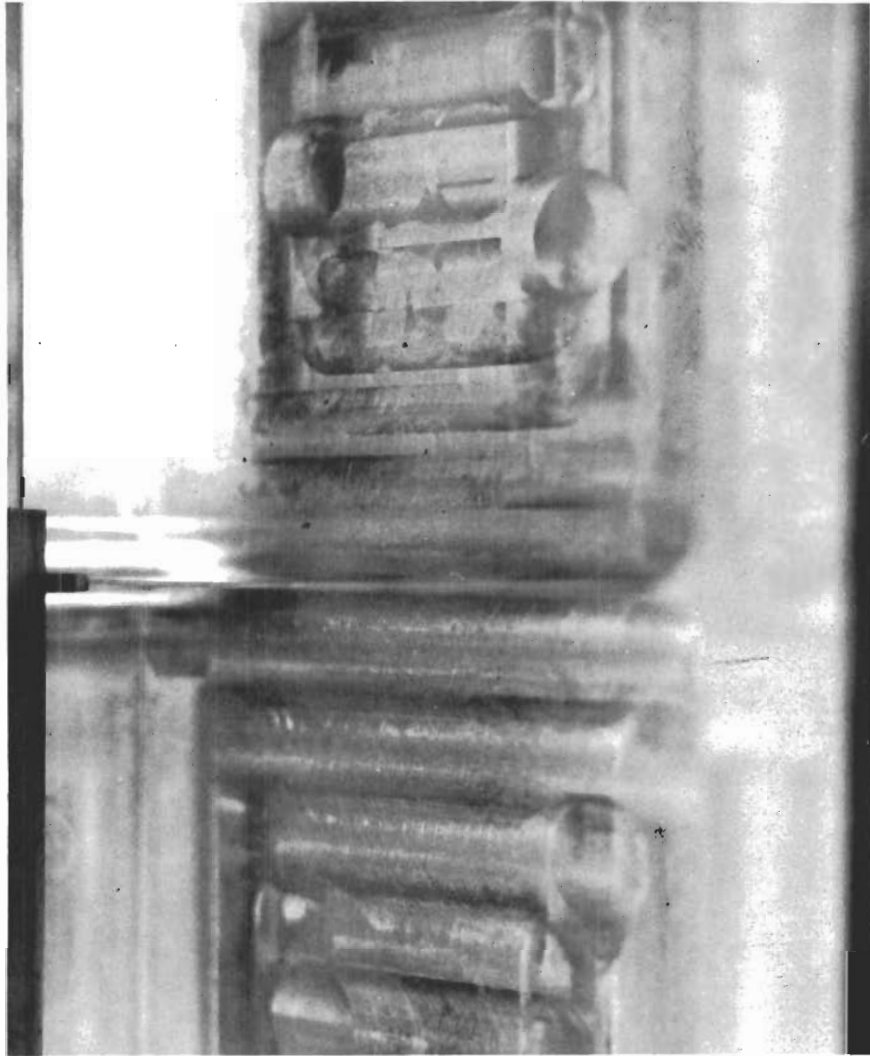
Buckling of Longitudinal Stiffener in Model No. 3, Transverse Loading.
